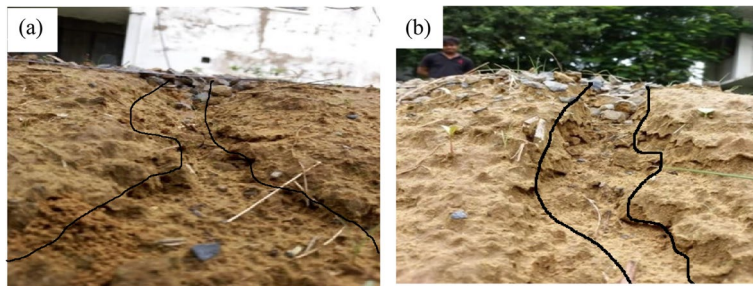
a Depicting a new gully on left hand side of embankment. b Showing a new gully formed on less compacted central portion of embankment
